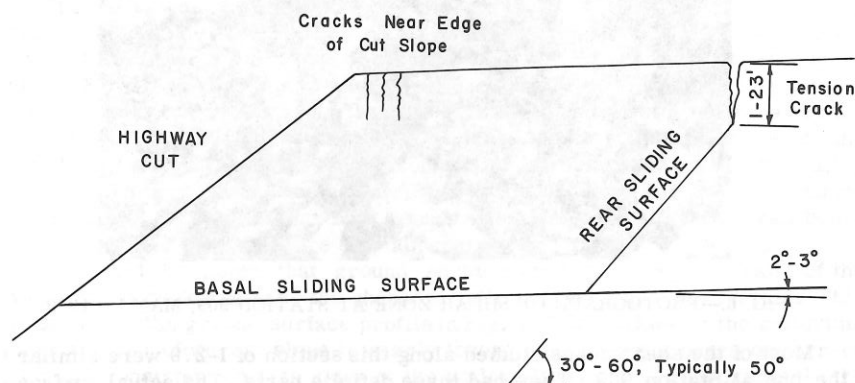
SCHEMATIC CROSS SECTION OF TYPICAL FAILURE MASS
